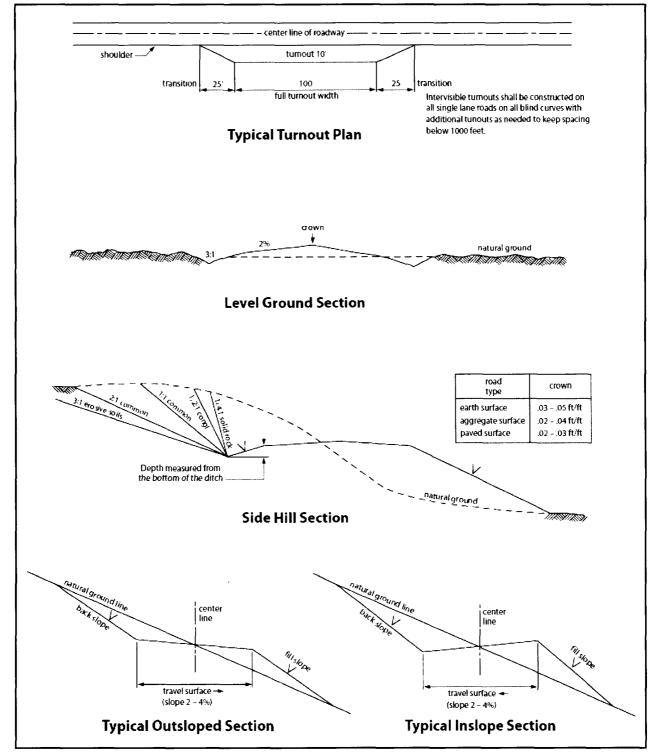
Cross-sections and plans for typical road sections representative of BLM resource or FS local and higher-class roads.
